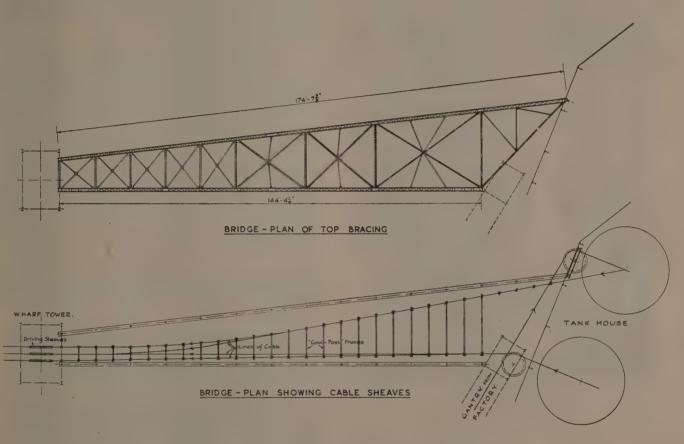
Plans of Bridge Top Bracing and Cable Runs
